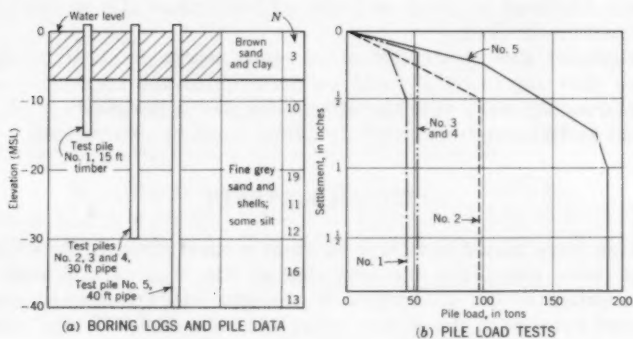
PILE TESTING. GENERAL CONSTRUCTION, 19-FOOT PRESSURE TUNNEL CONVERSION
